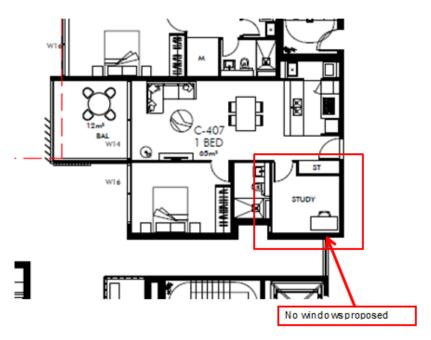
Apartment C-407 with no window in study, similar in C-307 and C-507
